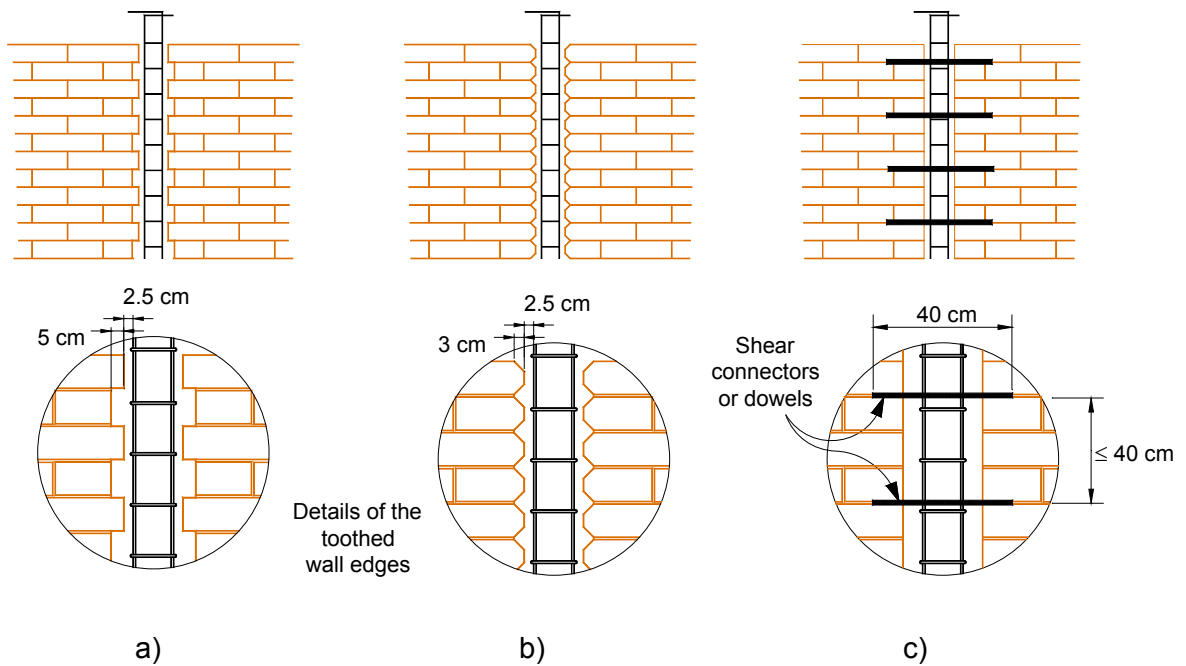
Tothing in confined masonry walls: a) machine-made hollow units, b) hand-made solid units, and c) provision of horizontal reinforcement when tothing is not possible.
